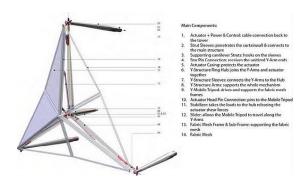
Conceptual detail of the kinetic component of the Al-Bah Towers facade. (Source: https://laviebohemetravel.wordpress.com).
